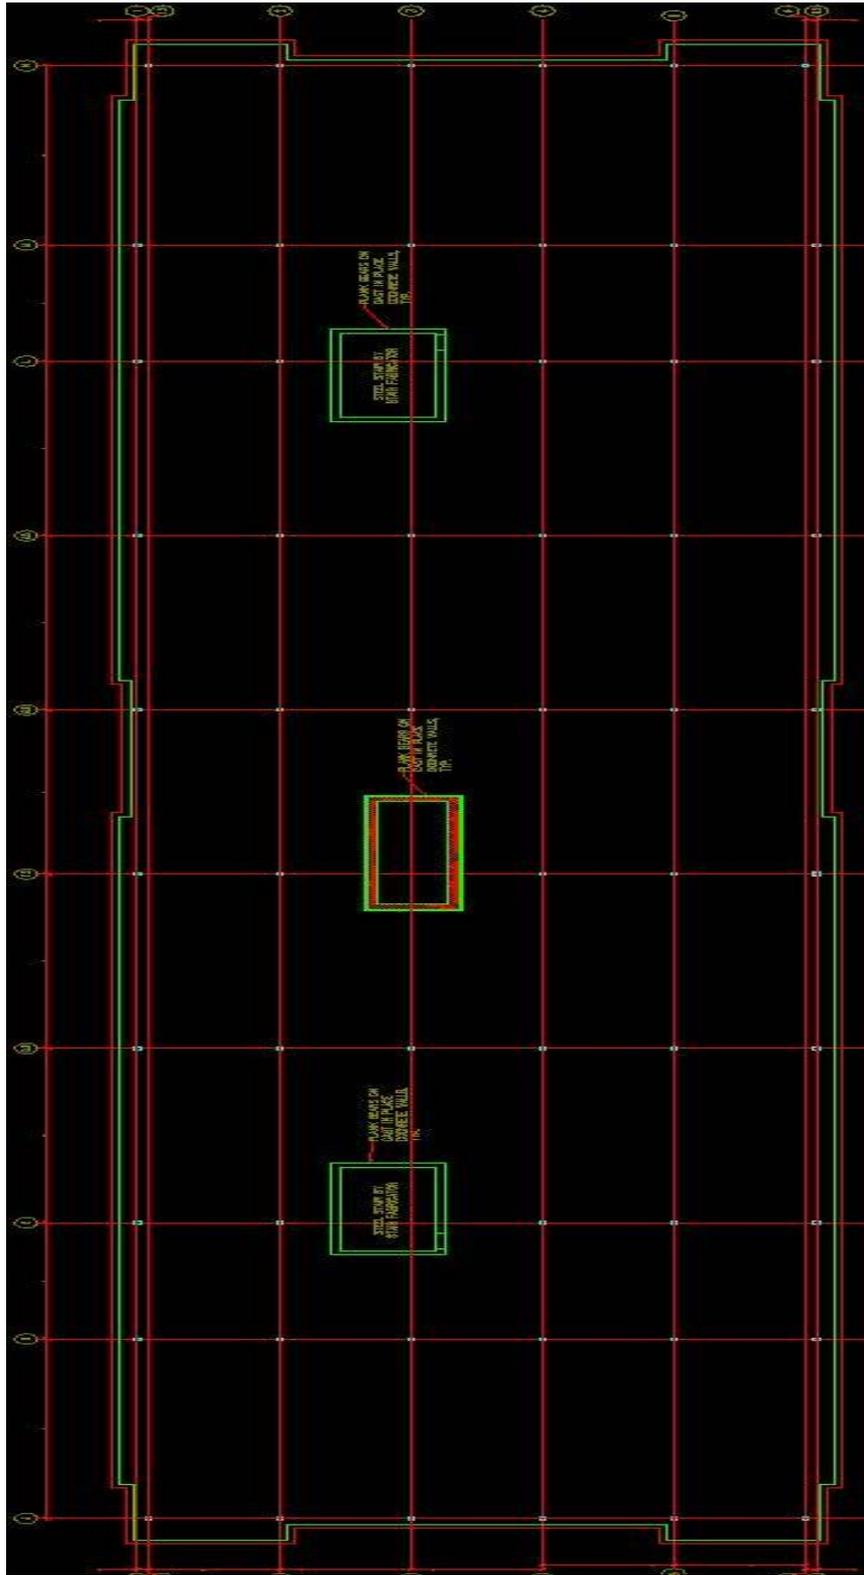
Lateral System Floor Plan with Columns and Shear Walls
